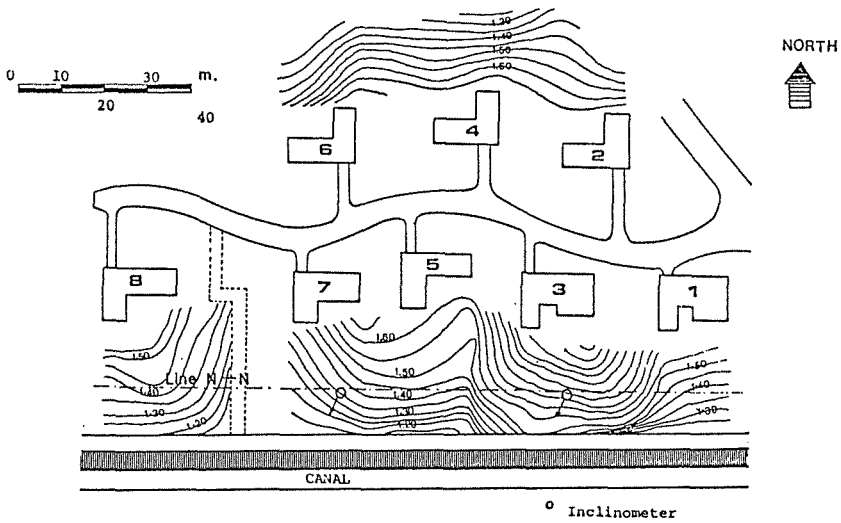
Contour Elevation at New Zealand Housing, AIT Campus
